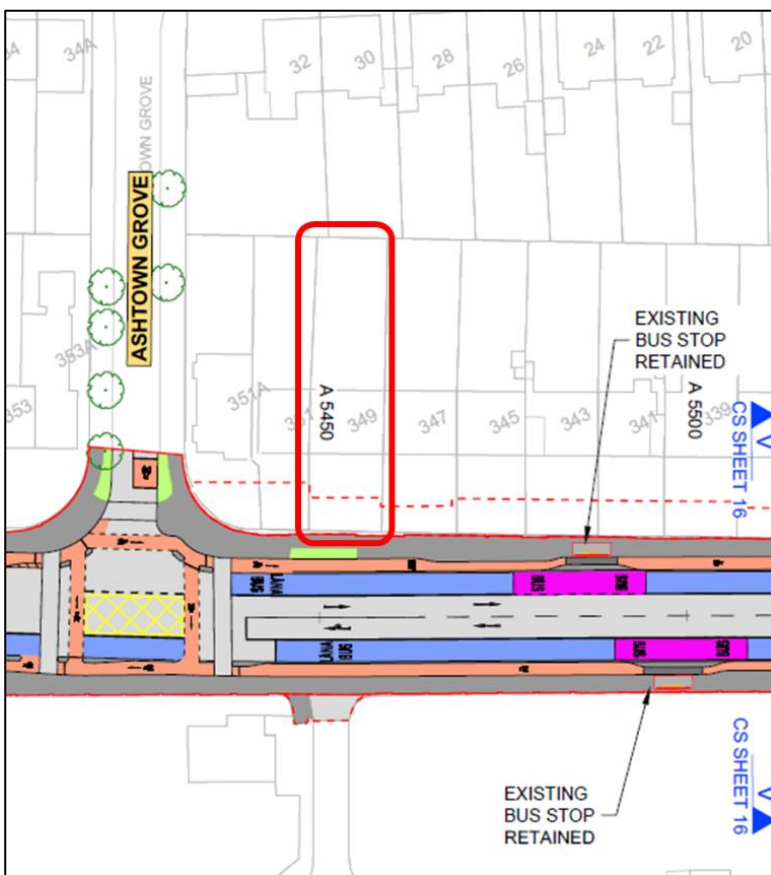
Proposed new Layout at 349 Navan Road
